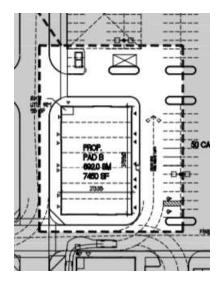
C - Proposed Site Plan Amendment – Details Pad B
